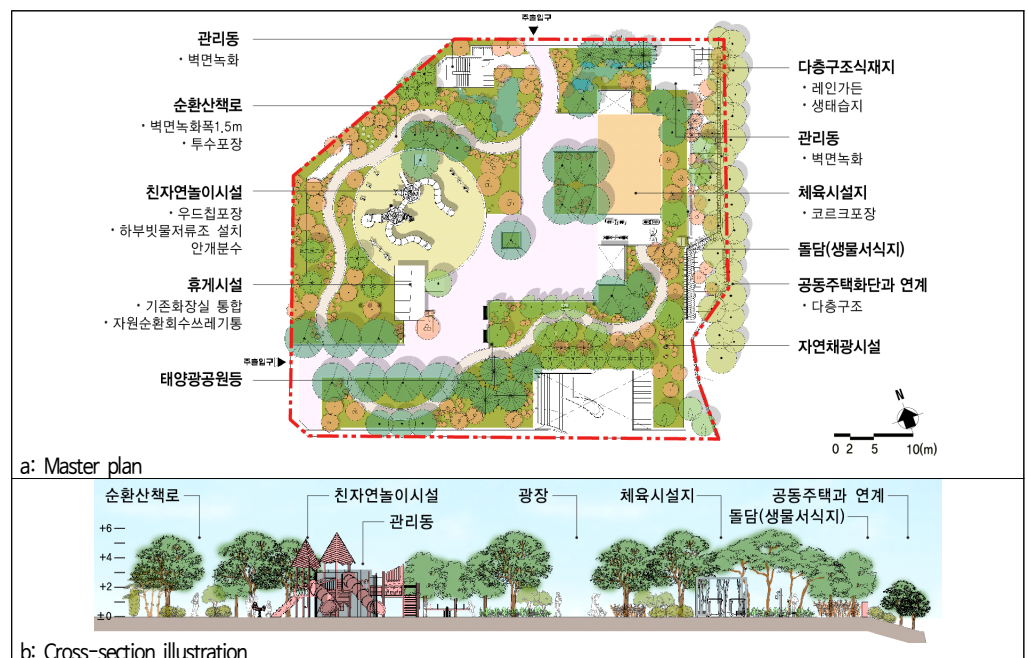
Master plan and cross-section illustration of Dangmal Children's Park
